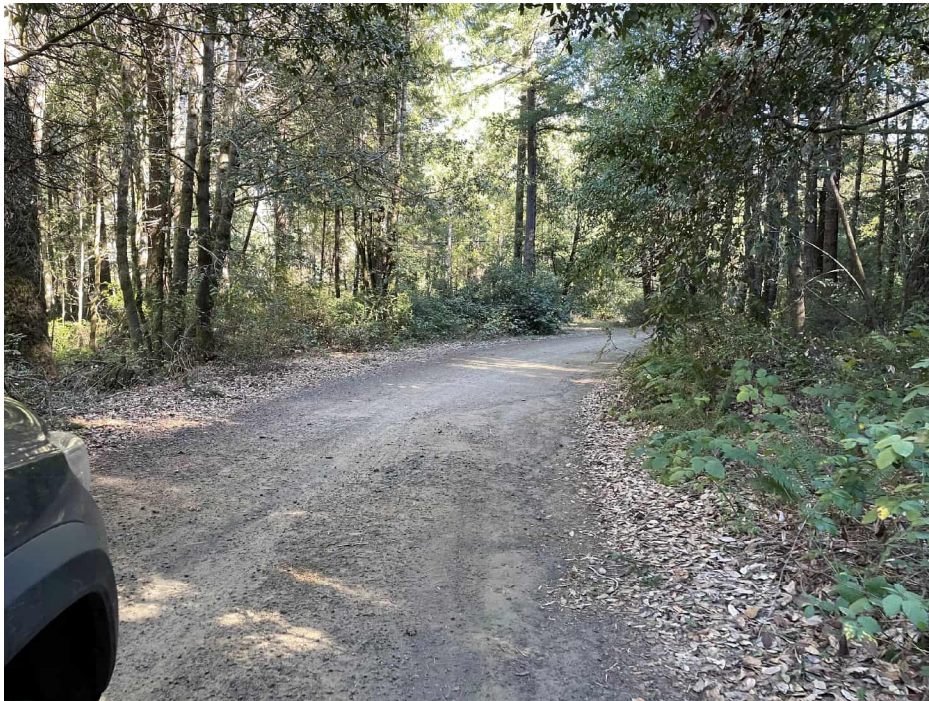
RP3. Milky Way Loop - 14' dirt/gravel road width Image facing south; towards the subject parcel.
